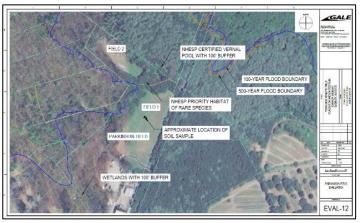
Example Base Plan (Parkinson Field)
